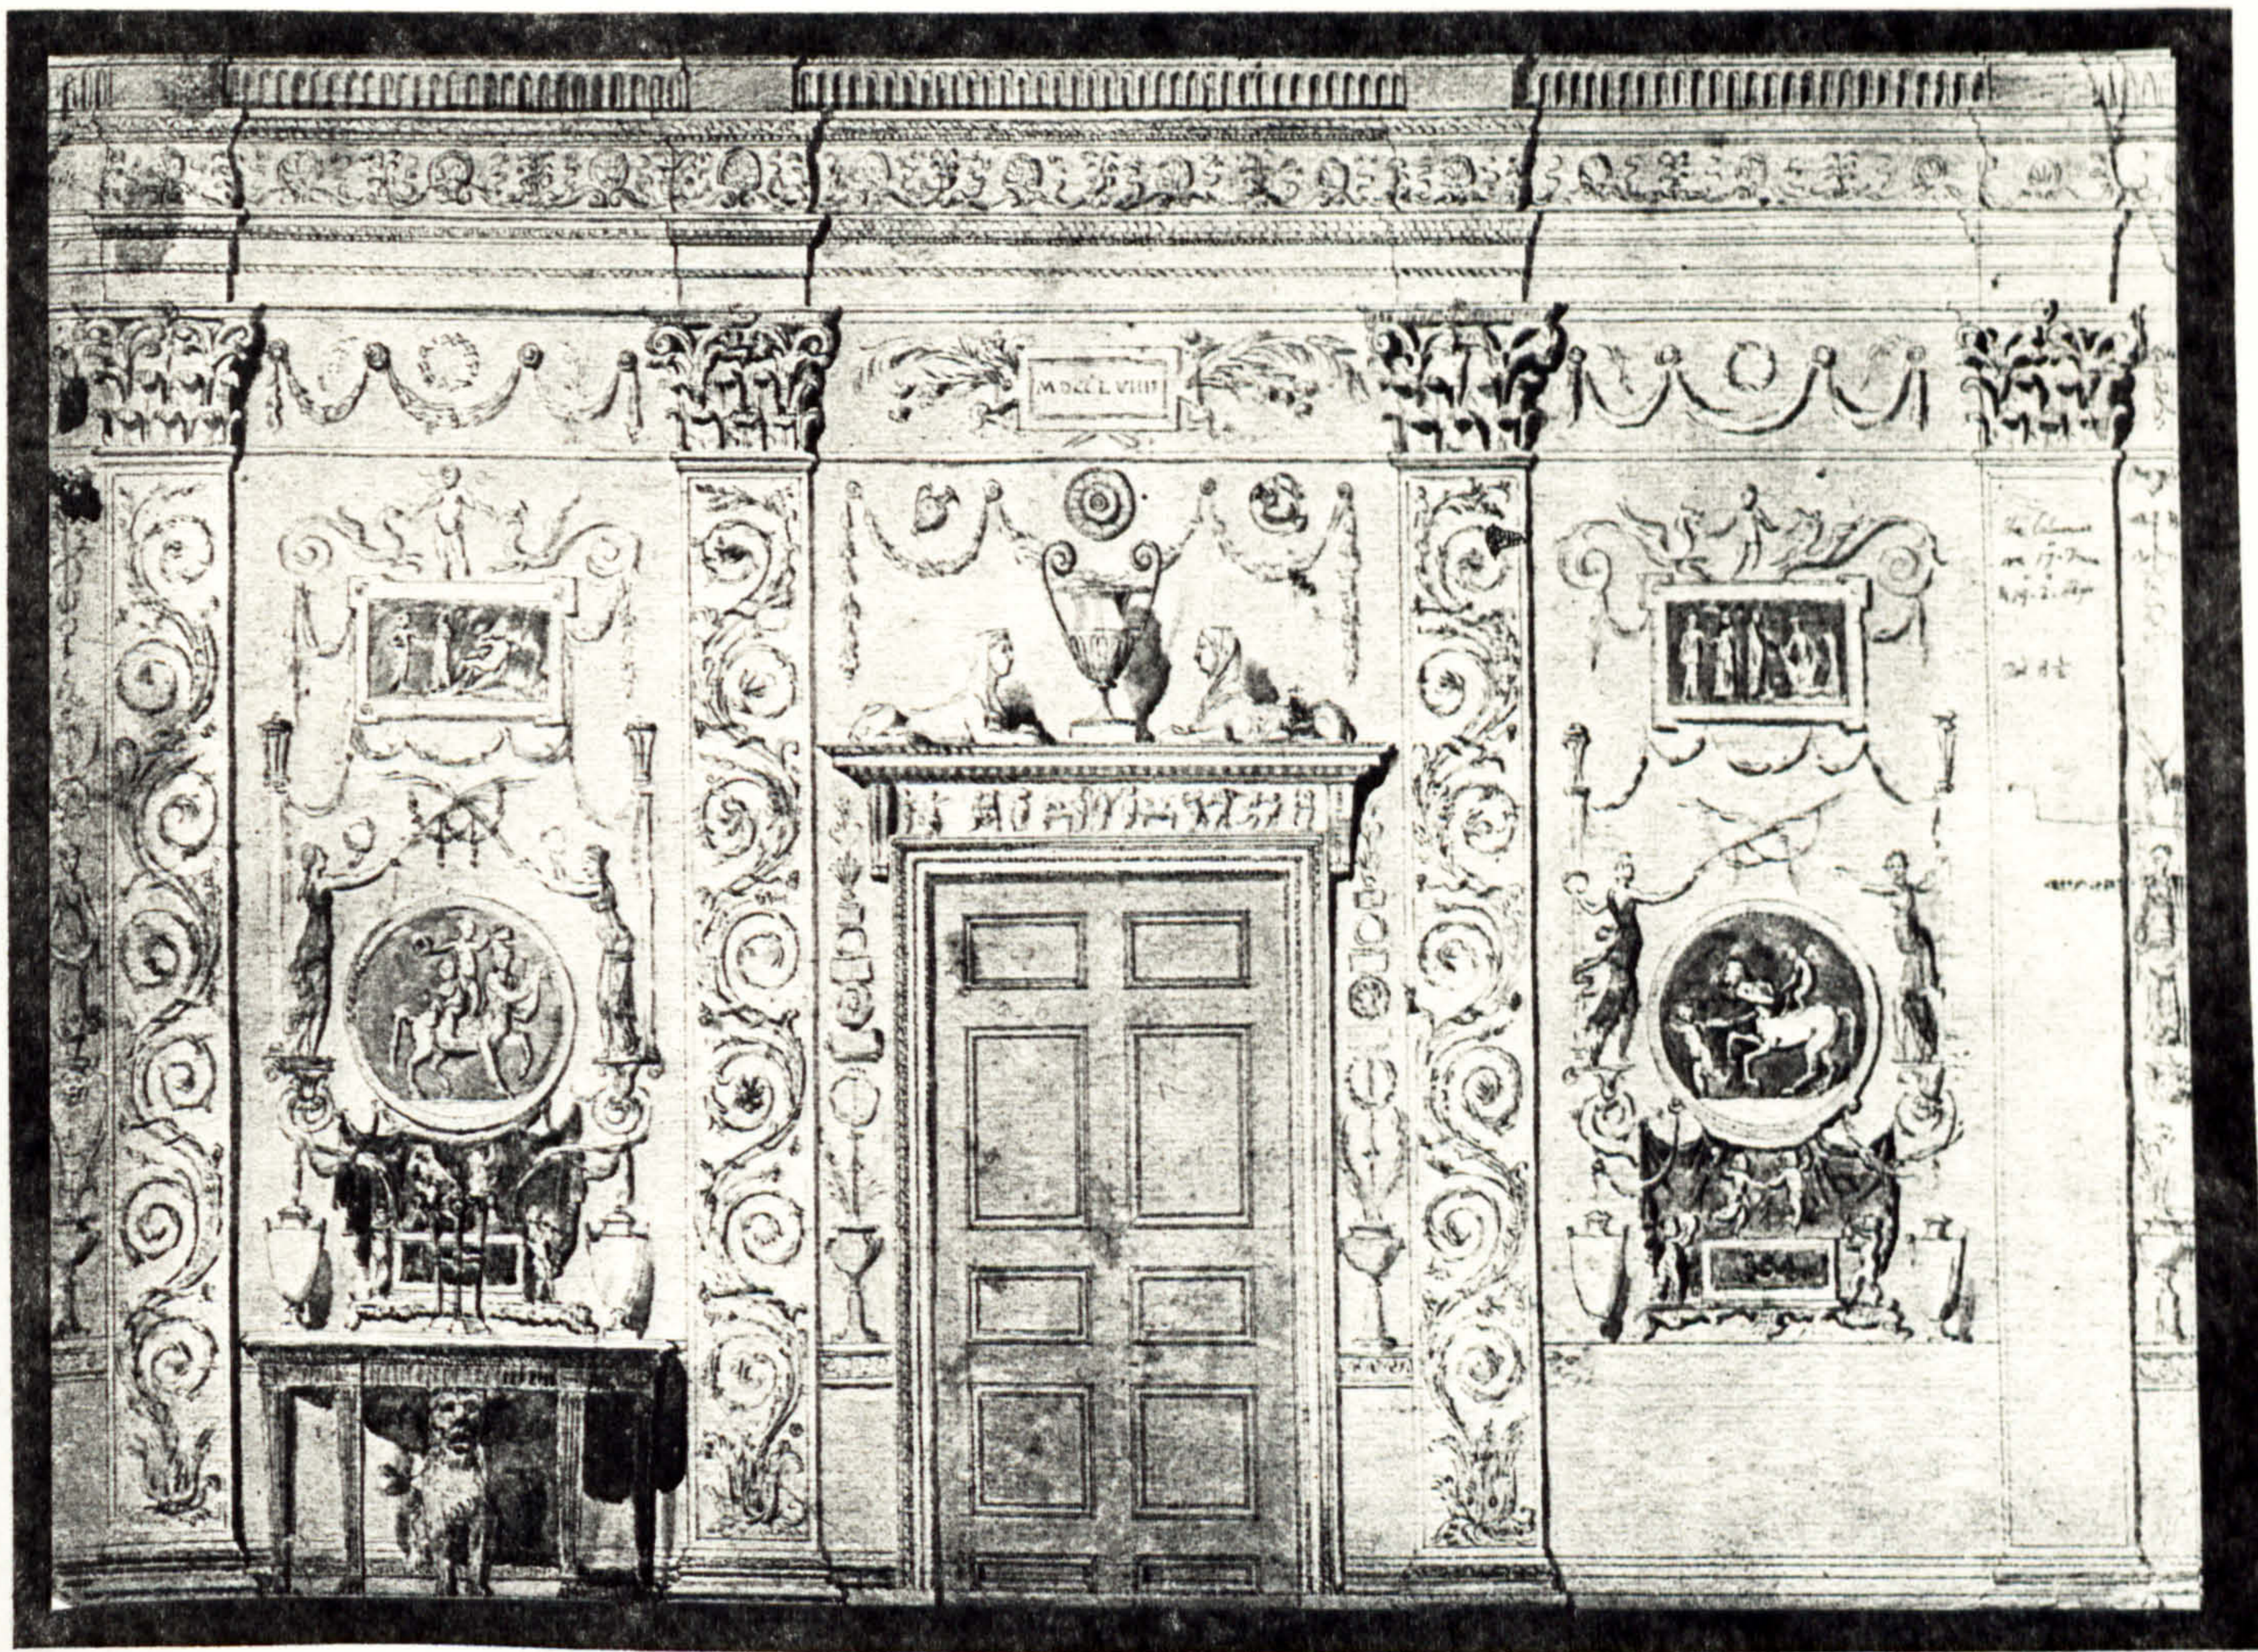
JAMES STUART · ELEVATION FOR THE PAINTED ROOM AT SPENCER HOUSE · 1759
